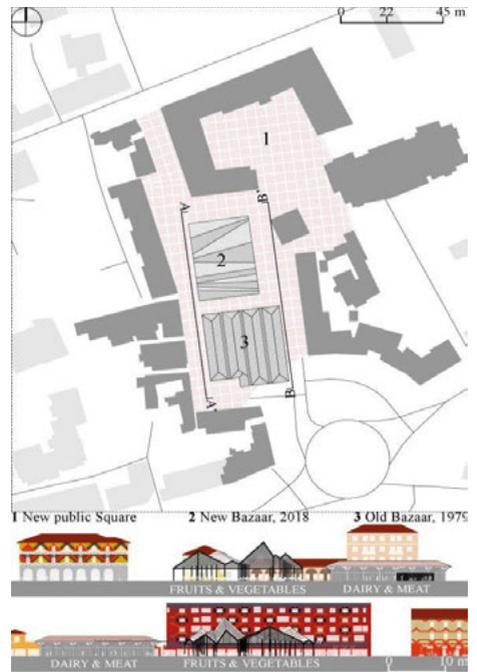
Tirana Bazaar: general plan with territorial sections (Source: Mirra, 2022)
